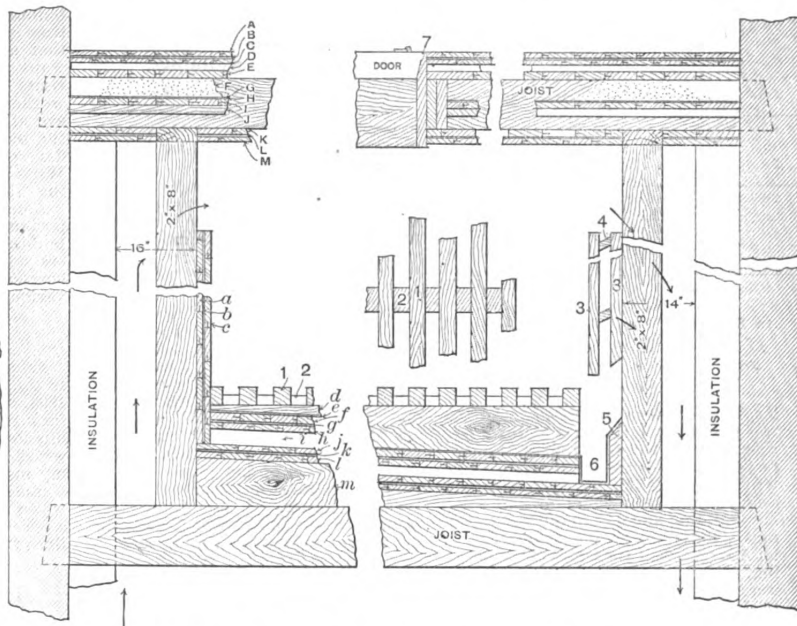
Section through the Ice Box and Icing Deck Floor.
